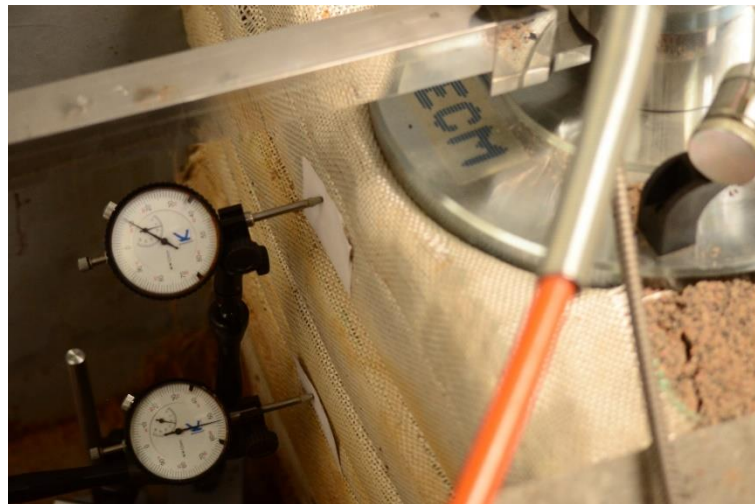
Failed wall after test with sand + 20% tyre crumb mixture as backfill
